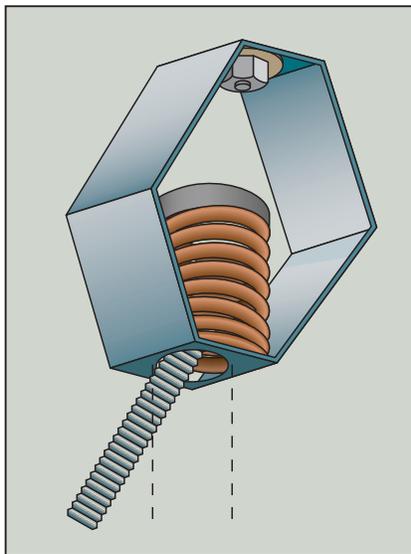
Hanger rod should not contact the hole in the bottom of the isolator box.
